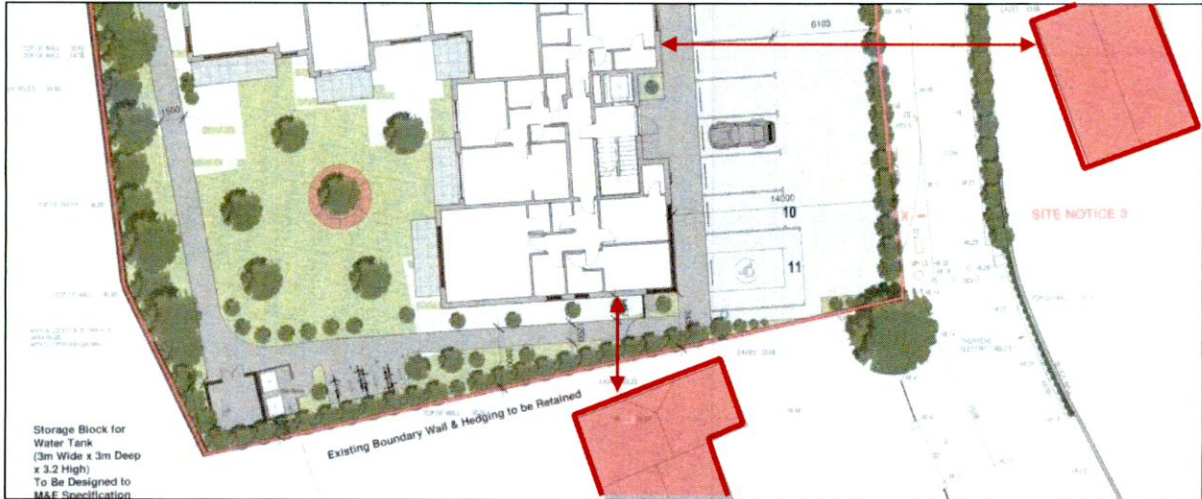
Extract from the site layout plan showing the lack of separation distances to existing dwellings (red outline).
